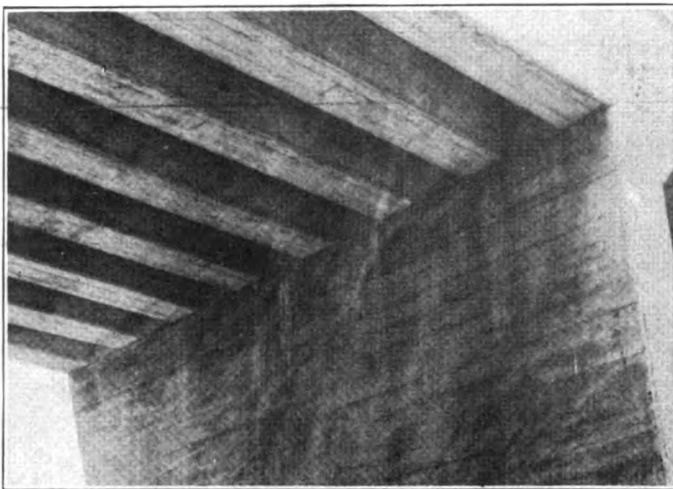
View of Under Side of Second Street Subway, Showing Reinforced Concrete Girders of Floor System.
